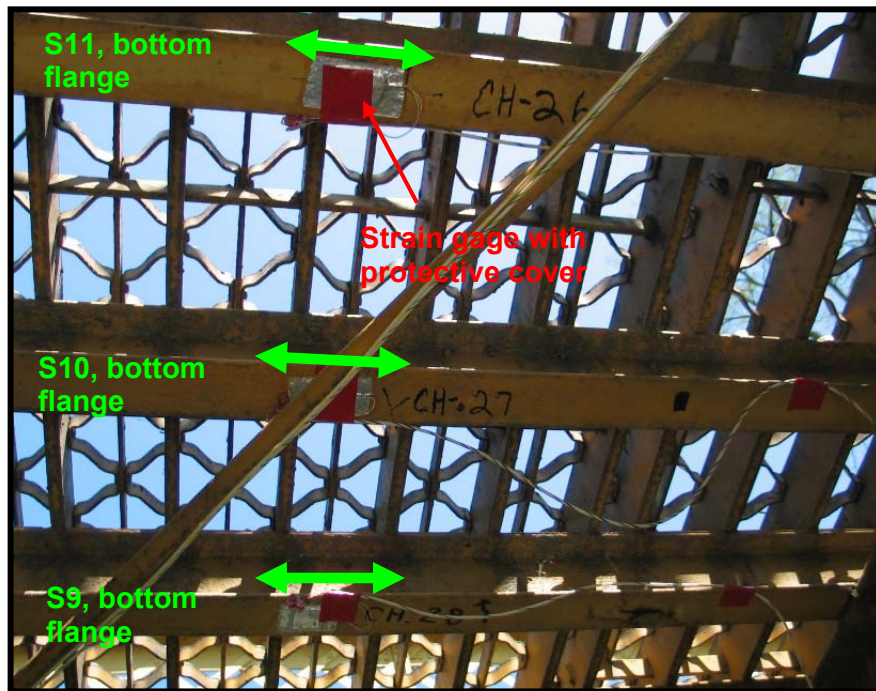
CH\_26, CH\_27, and CH\_28 installed on the bottom faces of the bottom flanges of stringers S11, S10, and S9, respectively.
